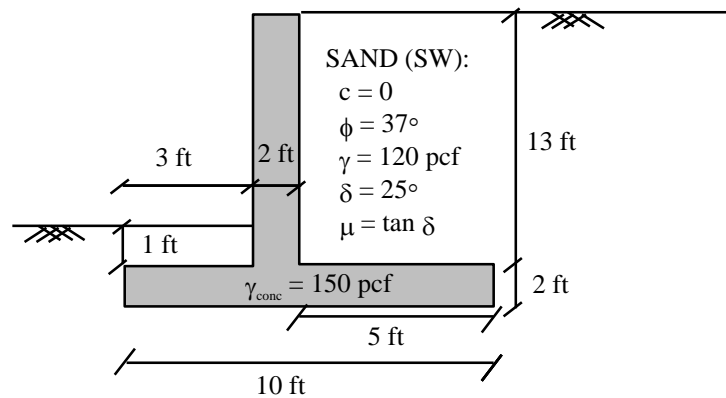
Cantilevered Retaining Wall with Well-Graded Sand Backfill (SW)
